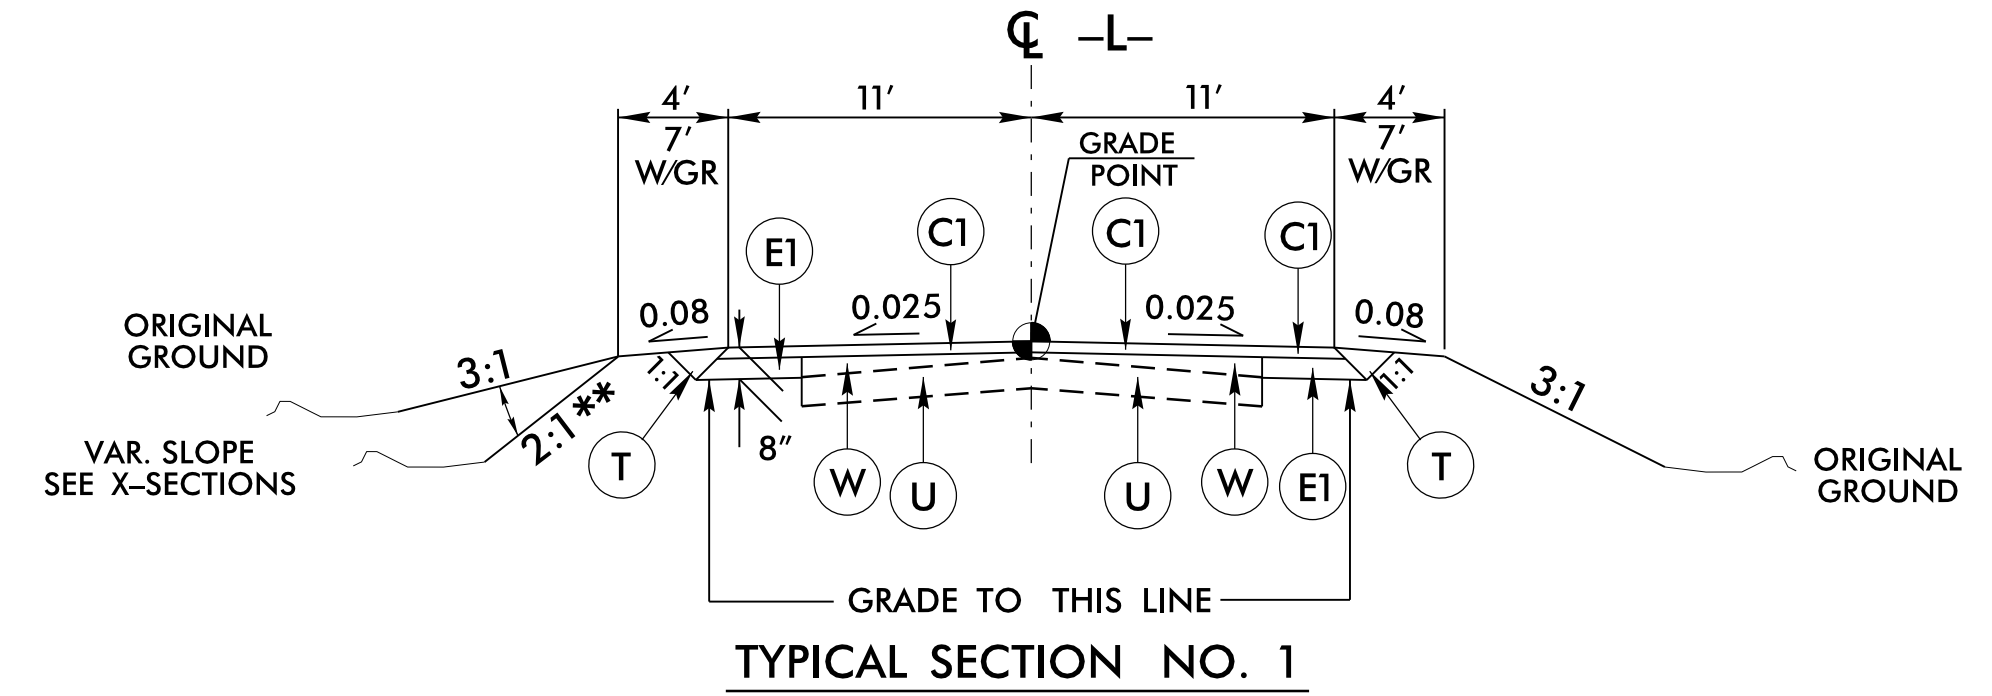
DETAIL SHOWING FULL DEPTH PAVED SHOULDERS TO FACE OF GUARDRAIL
